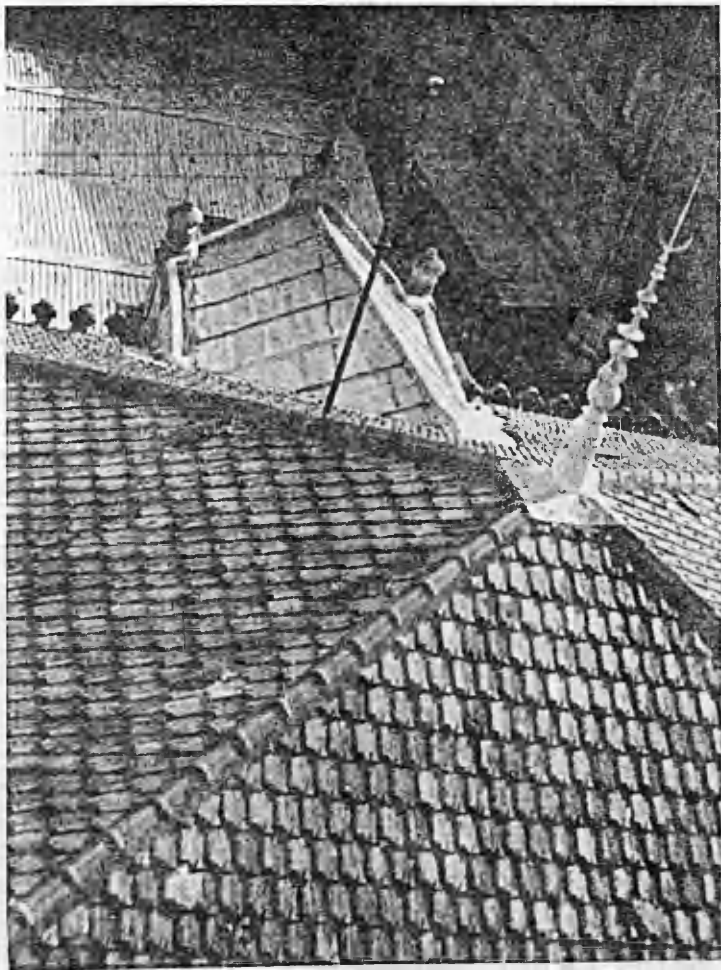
Terra-cotta tiled roof over the prayer hall.
